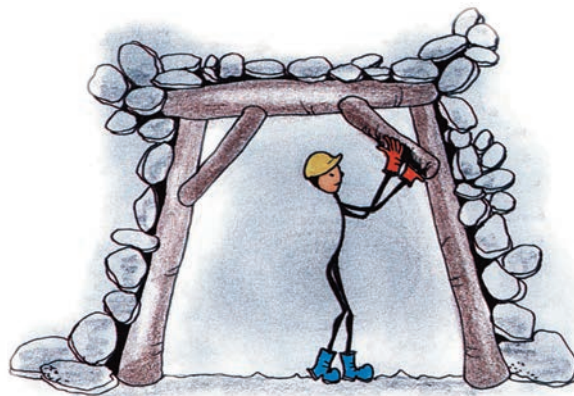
Entrance to a tunnel with well-supported walls and roof.
